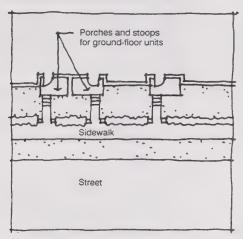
Generally, provide ground-floor units with individual entries from the street.
